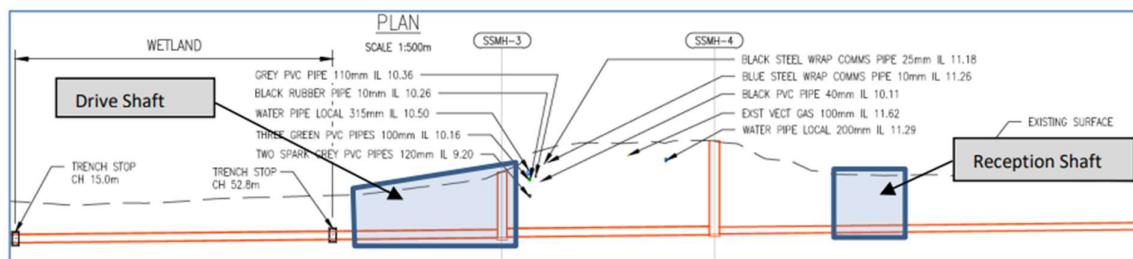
Indicative cross section of pipe hammering drive set up for the Brigham Creek Road works (Source: Brian Perry Civil)
